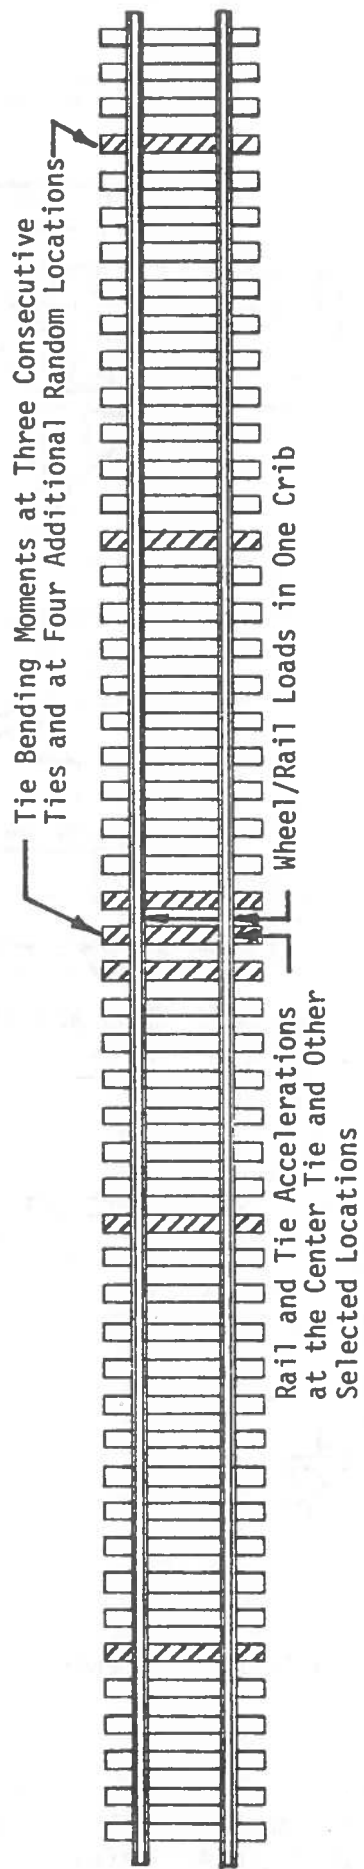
TYPICAL LAYOUT OF DYNAMIC MEASUREMENTS IN A TEST SECTION
